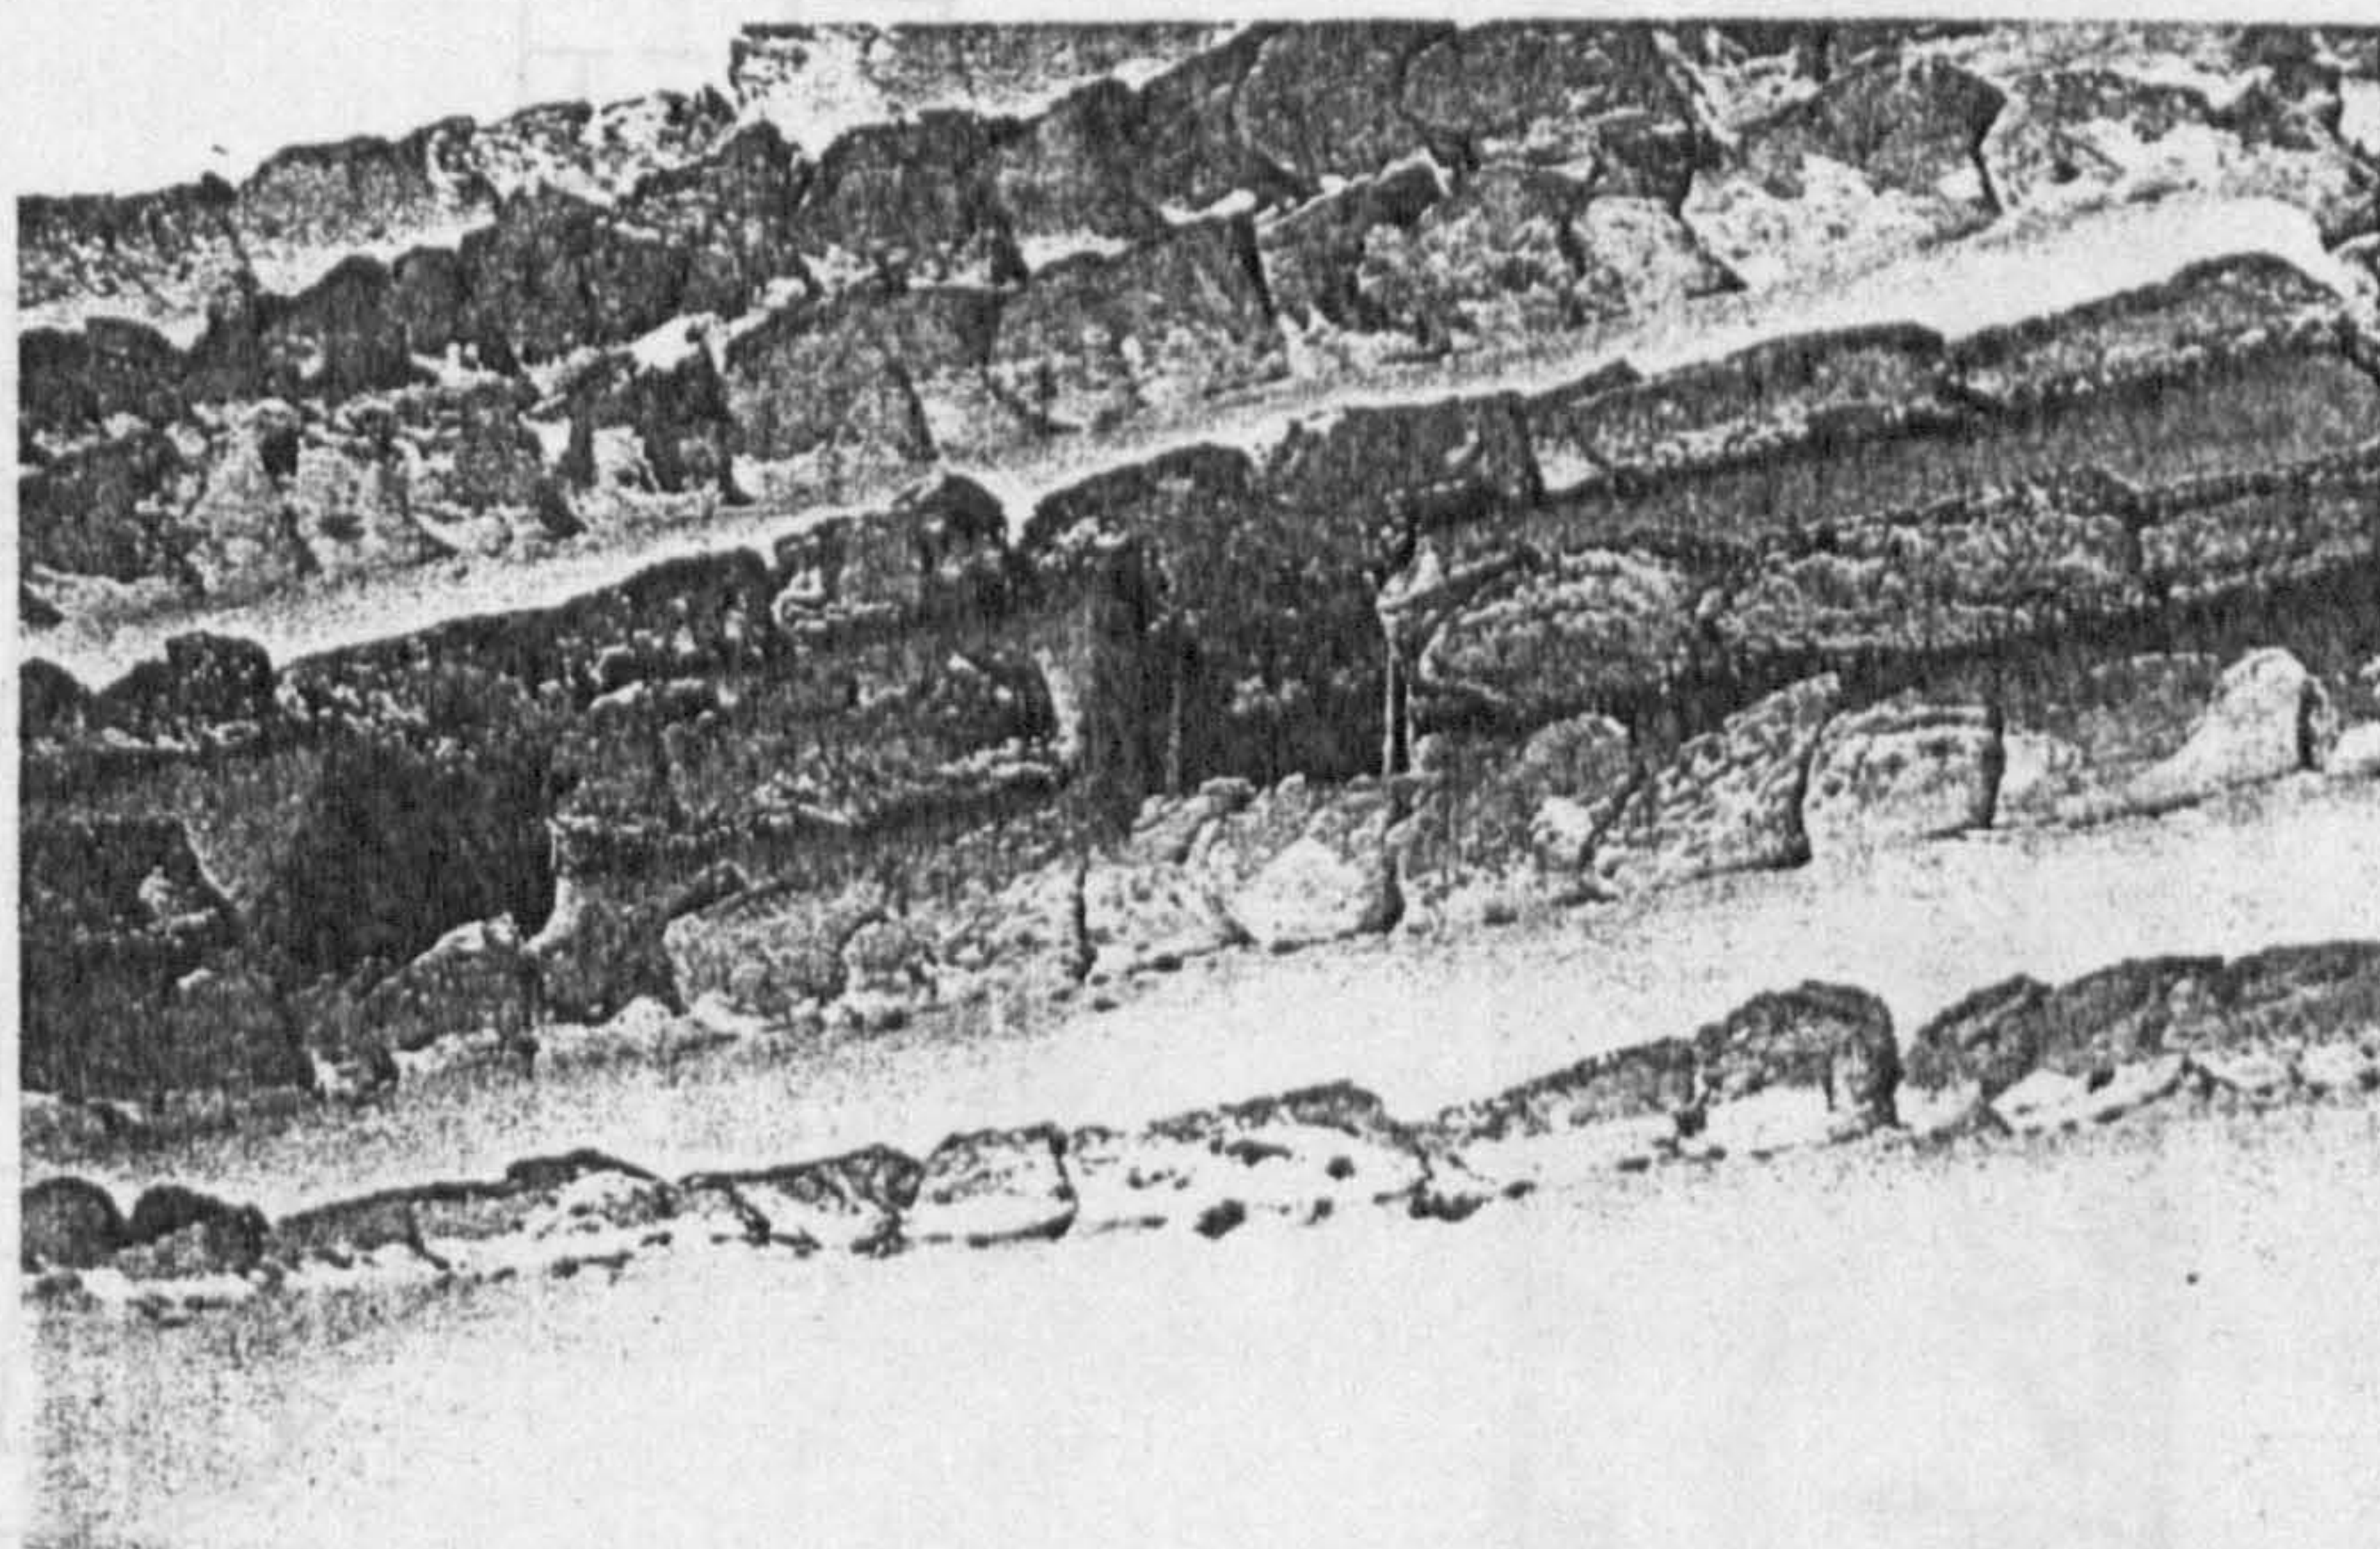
DETAILS OF BUILDING MATERIALS, ASIR (2)
